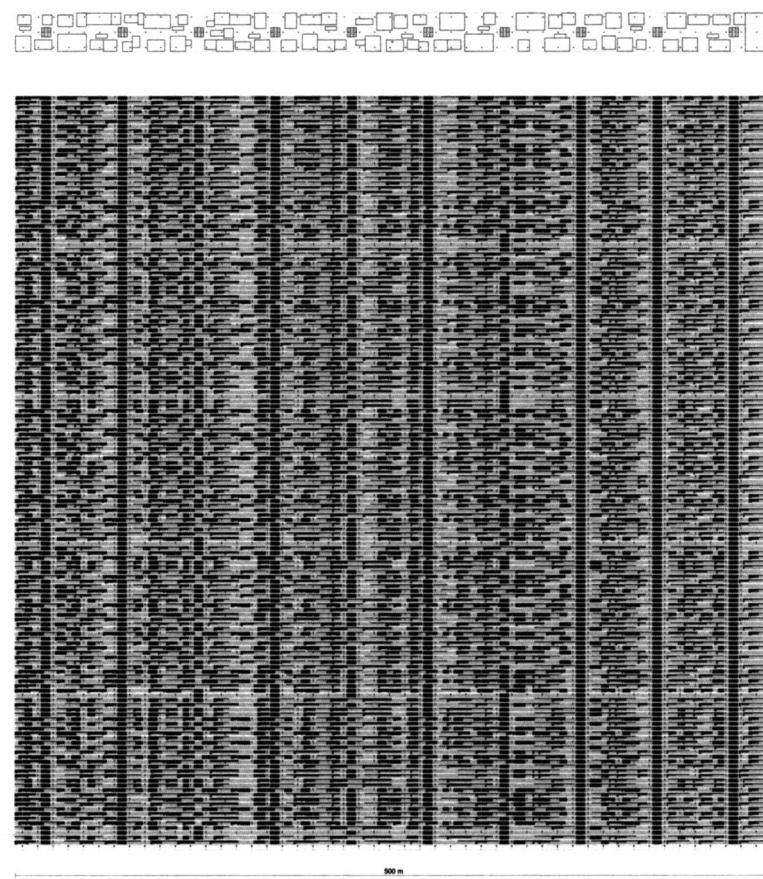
Typical plan and elevation of the unit for 60,000 inhabitants.
